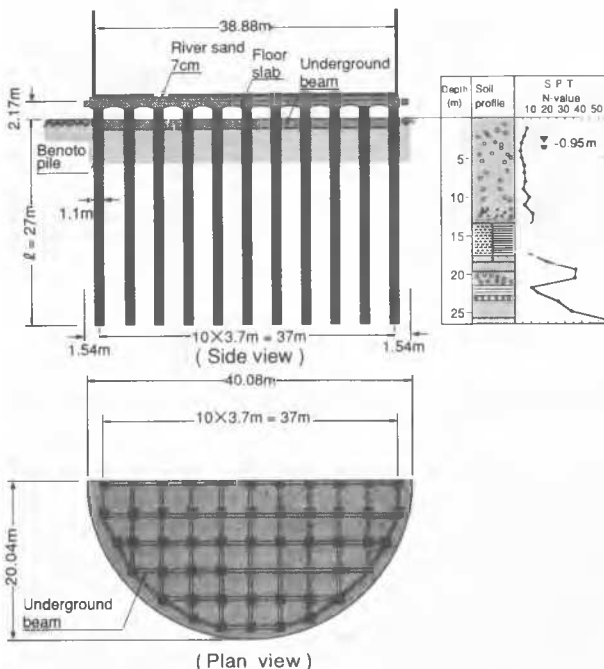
Side and plan views of the foundation pile layout for the cylindrical Tank101
